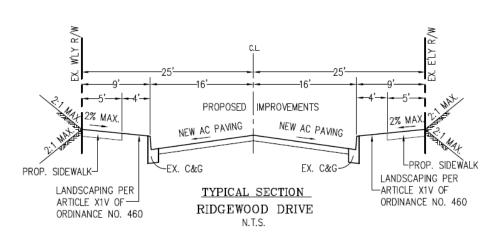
RIDGEWOOD DRIVE TYPICAL SECTION
